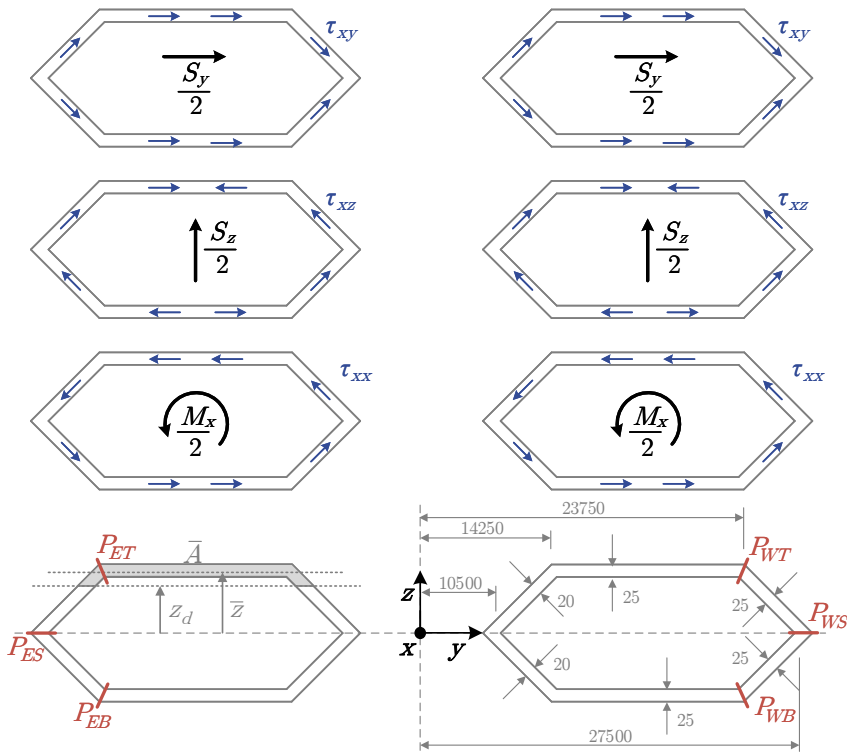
Bridge girder twin-box cross-section with critical points and assumed stress distribution for calculating cross-sectional stresses. All measurements are in mm.
